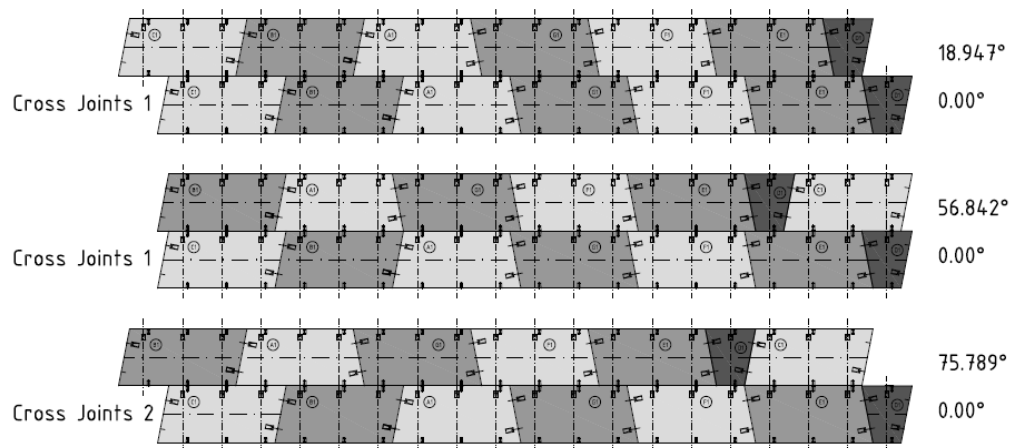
TBM tunnel not allowed rotations in trapezoidal precast segment. Cross Joint
